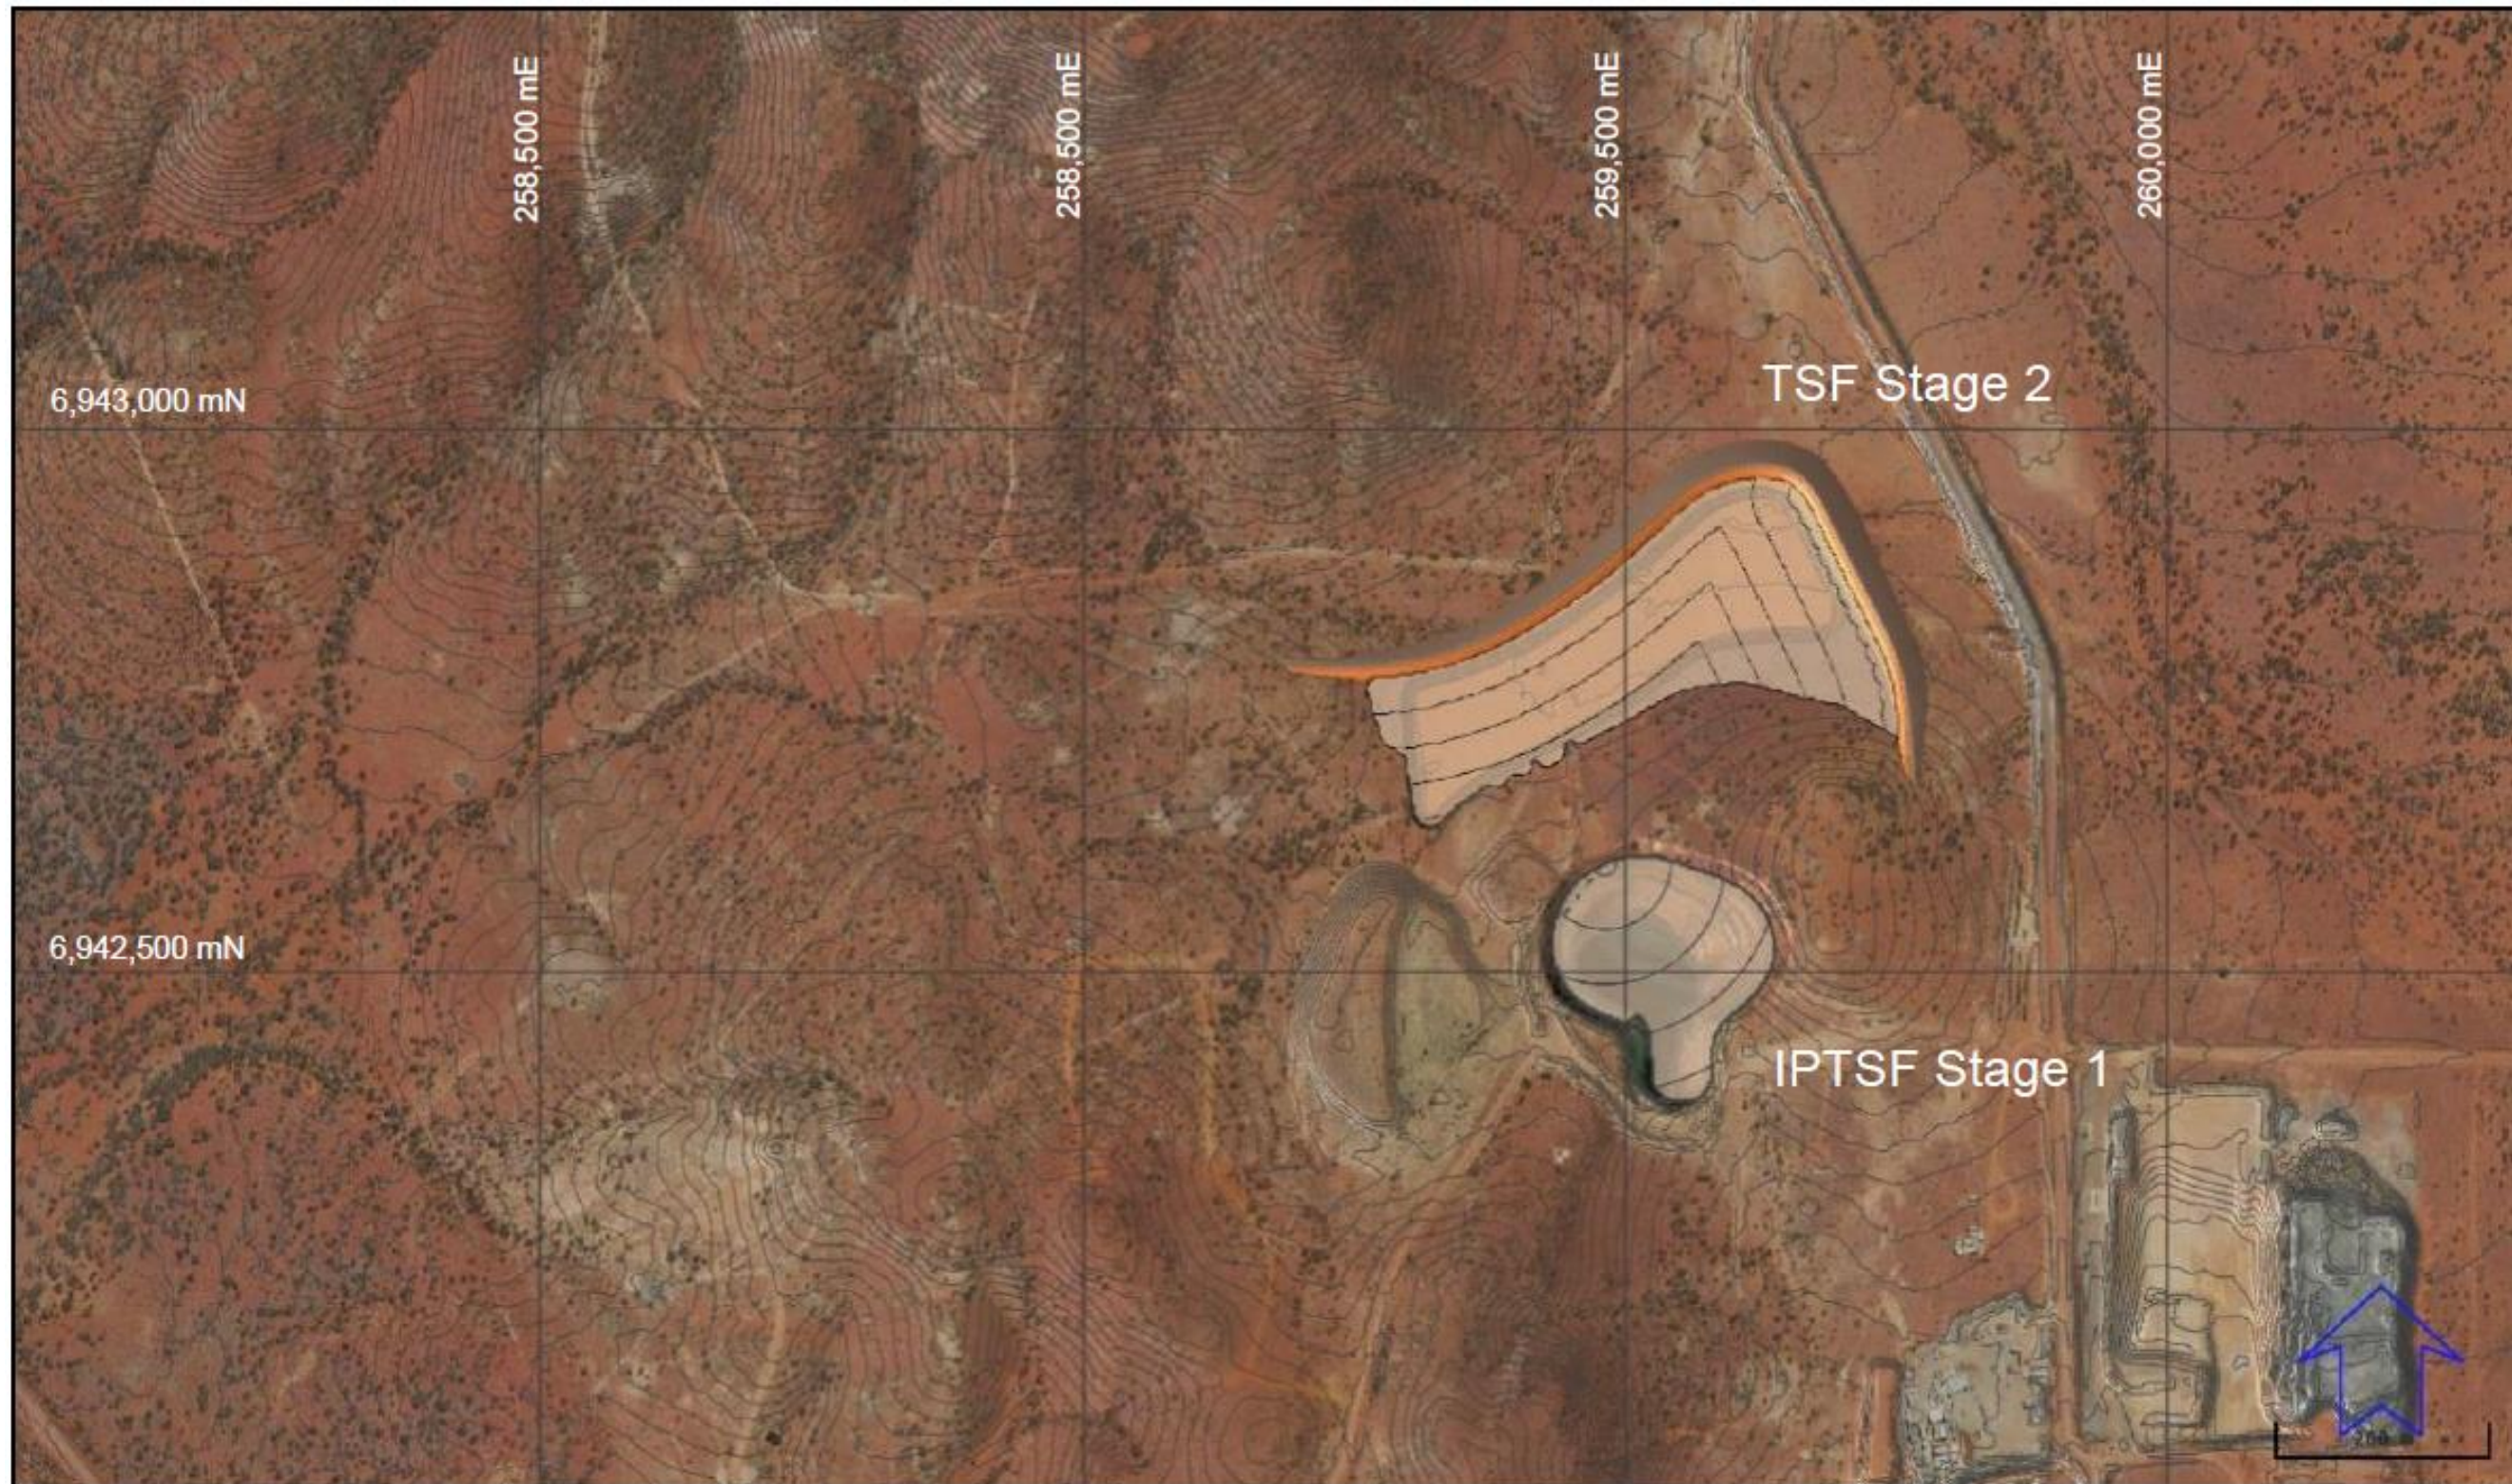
Location of in-pit TSF (stage 1) and TSF (Stage 2)
